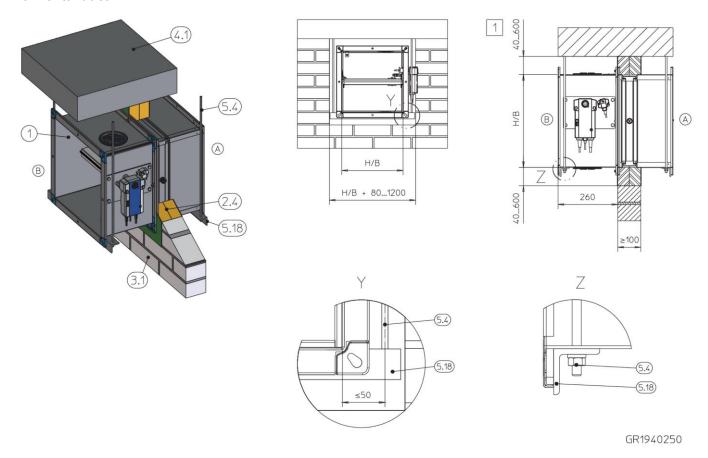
Dry mortarless installation with a fire batt, illustration shows installation into a solid wall (applies also to installation into a lightweight partition wall)
